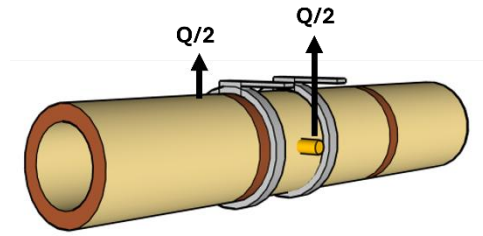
Load Q with Connector Perpendicular to the Axis of The Element
